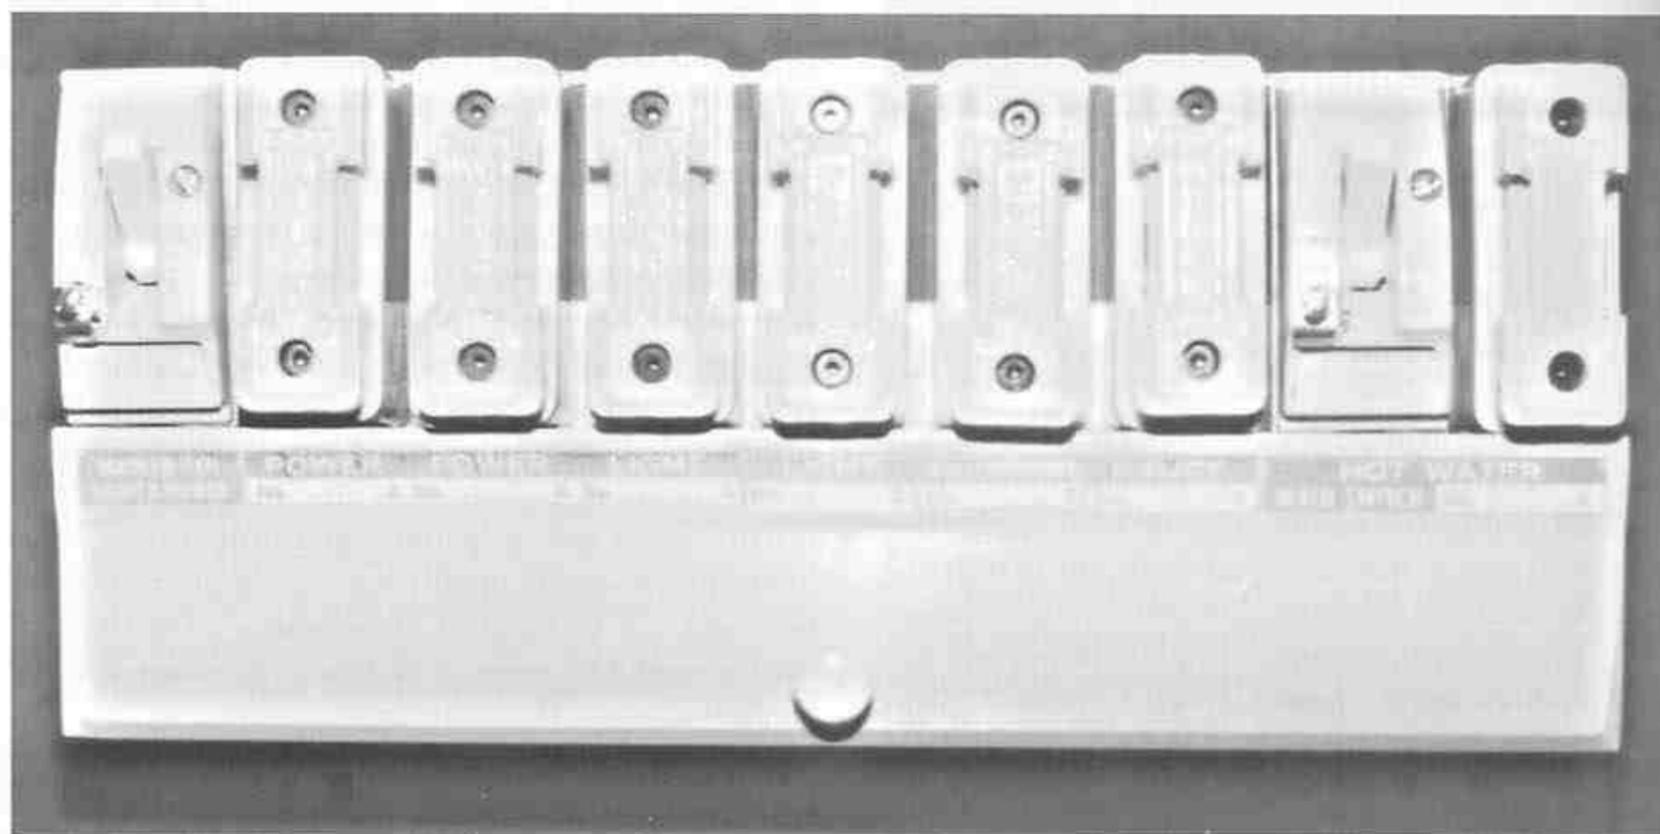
Domestic two-tariff switchboard using rewirable fuses (no RCD protection provided). Common in existing installations, not recommended for new installations
